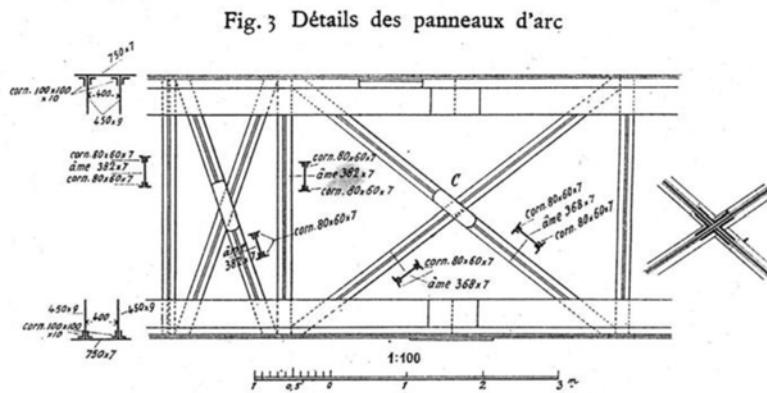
Galérie des Machines detail of truss cross-sections (Atlas of Places).
